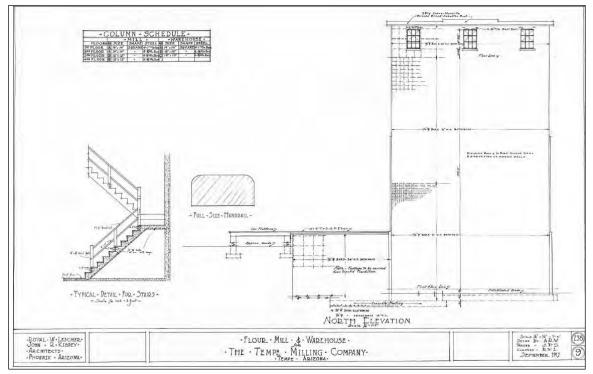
Architectural drawing of Hayen Flour Mill, 1917, north elevation (Architects Lescher & Kibbey)
